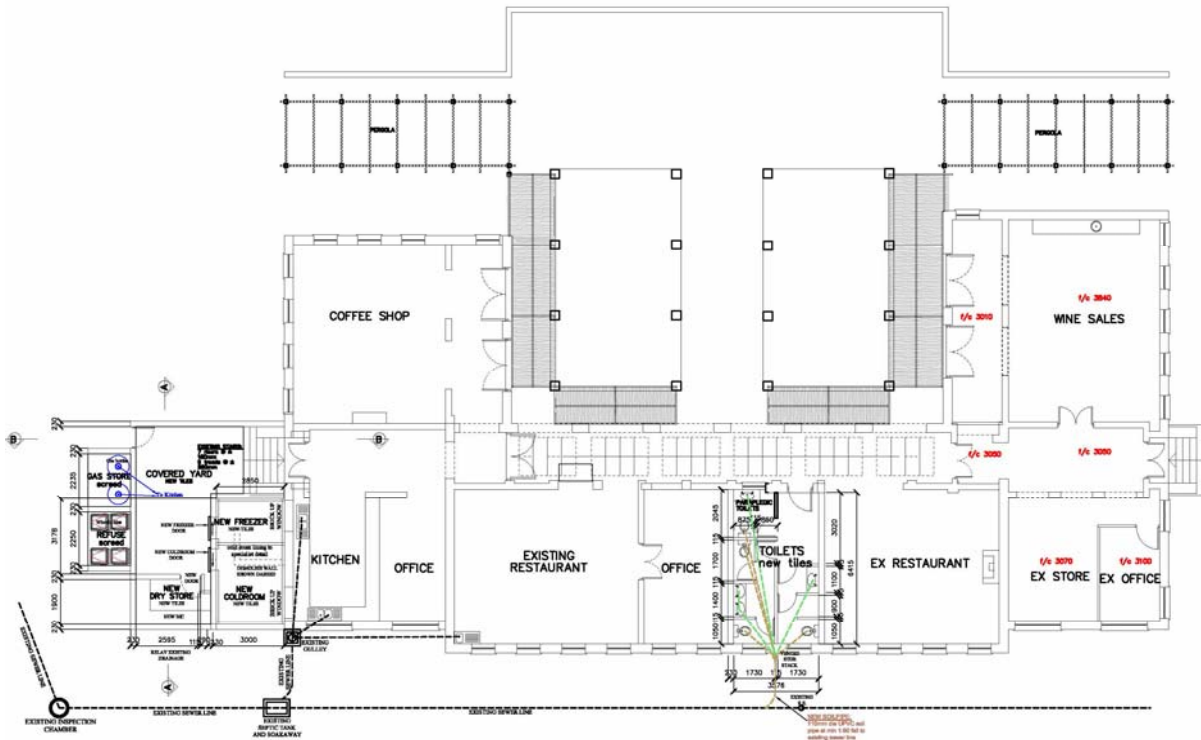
A 2008 building plan by Michael Dall Architects for internal alterations to create toilets (at the centre) and a service extension (on the left).
